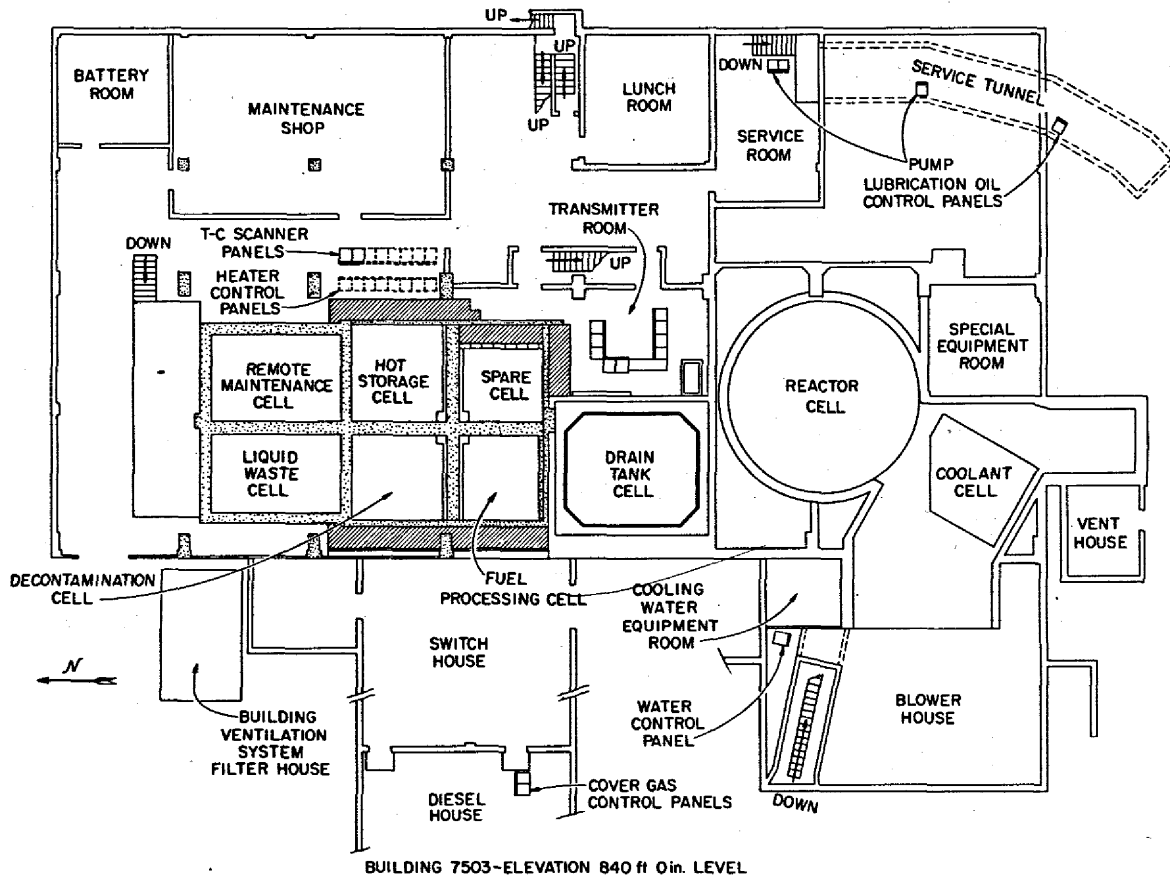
Layout of Building 7503 at 840-ft Elevation.
